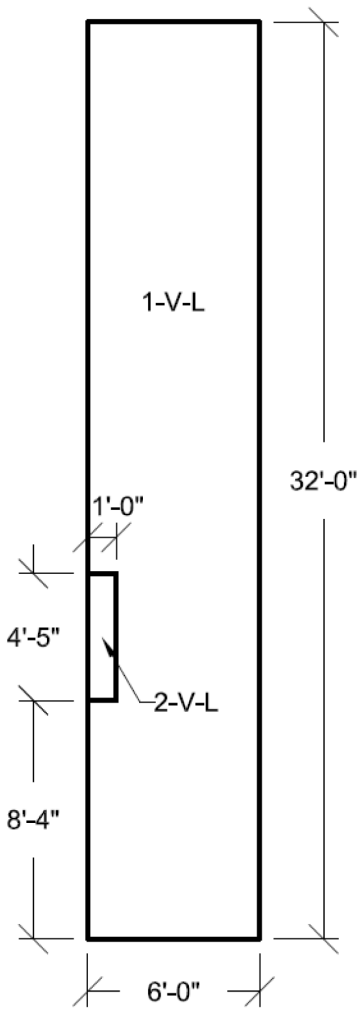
H.6-154A DGFO SV Slab 3 Looking Down
